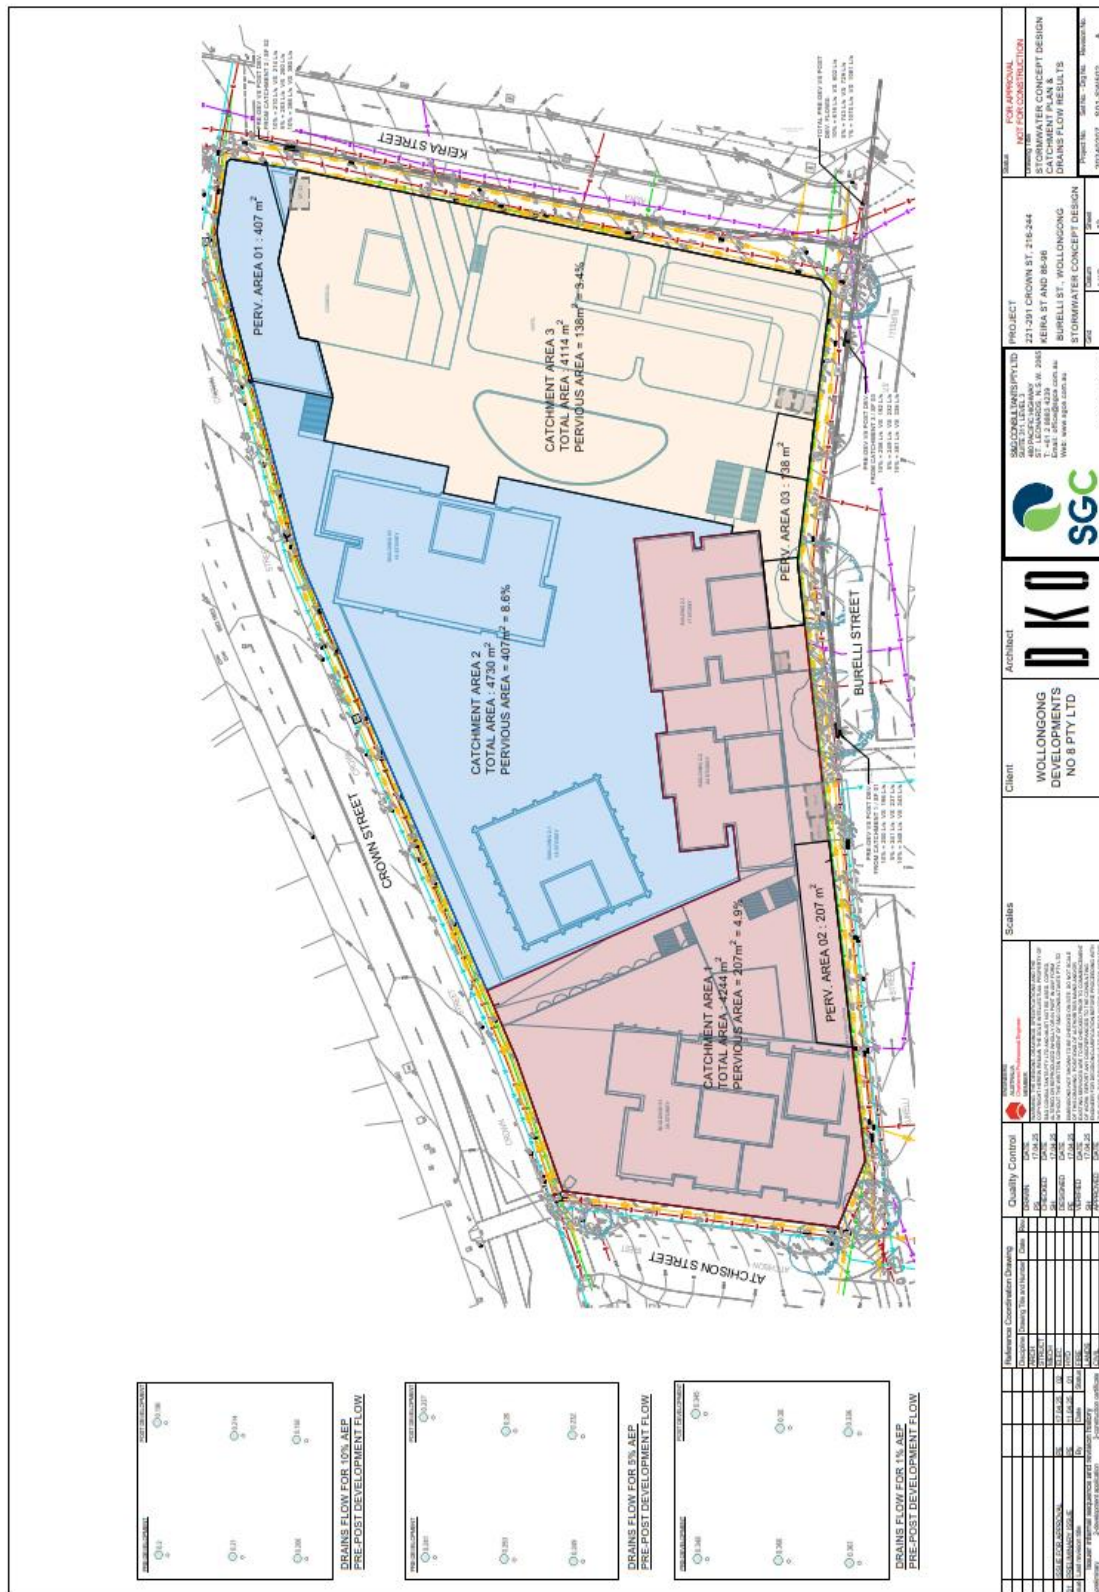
Drains Catchment and Flow Details Stormwater Plan
